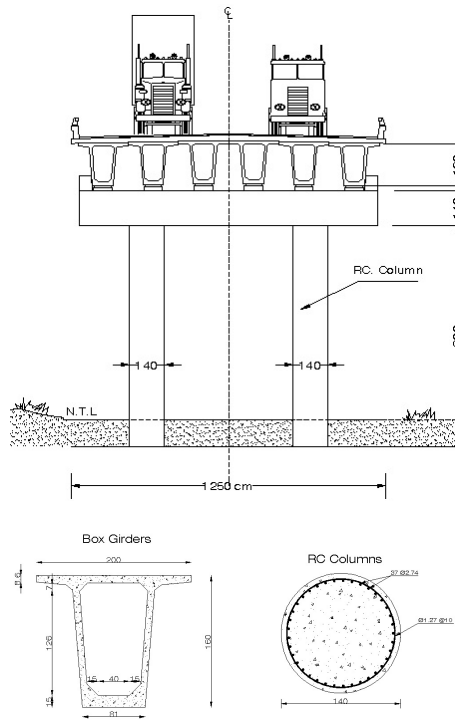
Plane, vertical view and details of the structure under analysis [cm].
